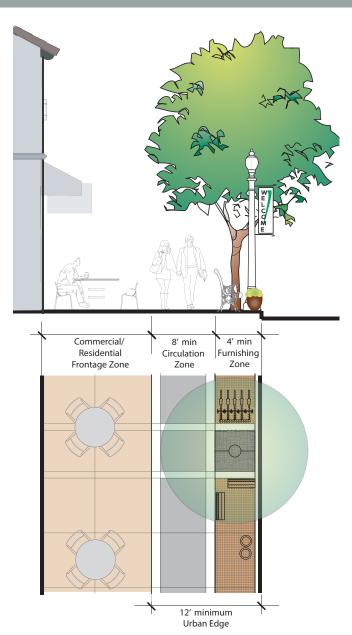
Streetscape Urban Edge Locations in the Downtown Concept Plan
